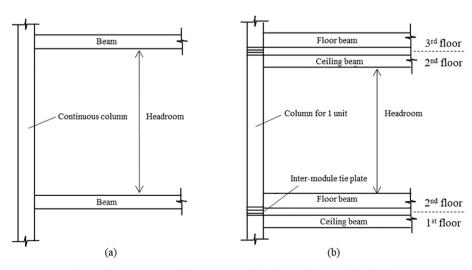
Elevation view of (a) conventional building and (b) modular building.
